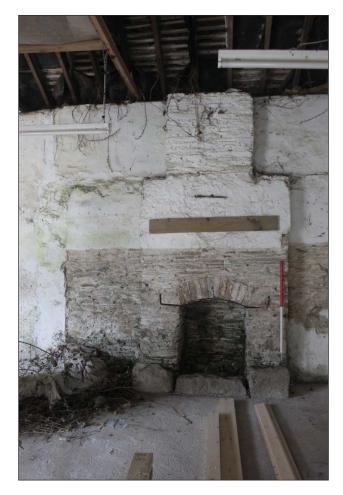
North range, fireplace in north elevation, looking north. 1m scale
